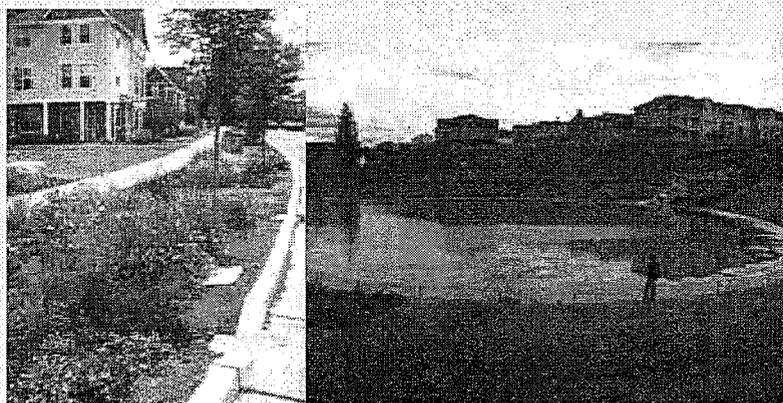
Natural drainage system methods have been applied to a 34-block, 1,600-unit mixed-income housing redevelopment project called High Point. Vegetated swales, porous concrete sidewalks, and frontyard rain gardens convey and treat stormwater on-site. On the right is the detention pond for the development.
